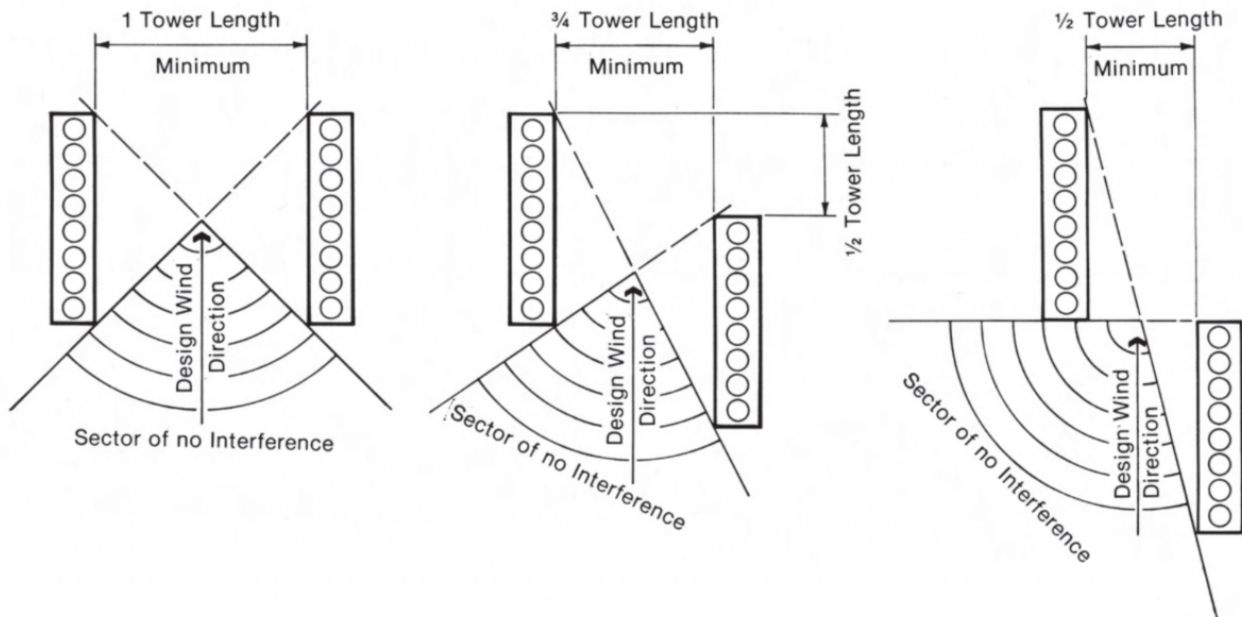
Recommended orientation of towers in a prevailing longitudinal wind
